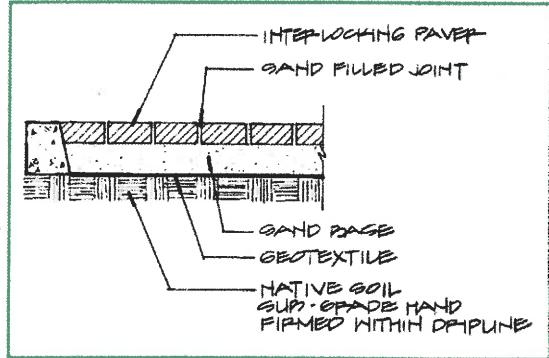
Brick or interlocking pavers on sand often are recommended as pervious paving. Use of geotextile under the sand and hand-firmed subgrade can minimize root impacts.
